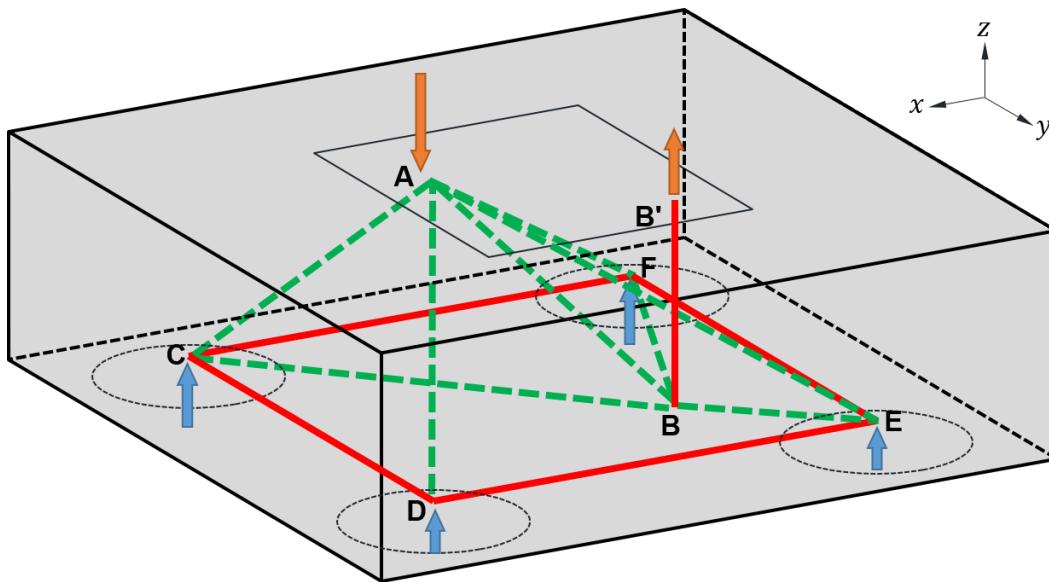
3D strut-and-tie model for drilled shaft footing under Load Case VI
